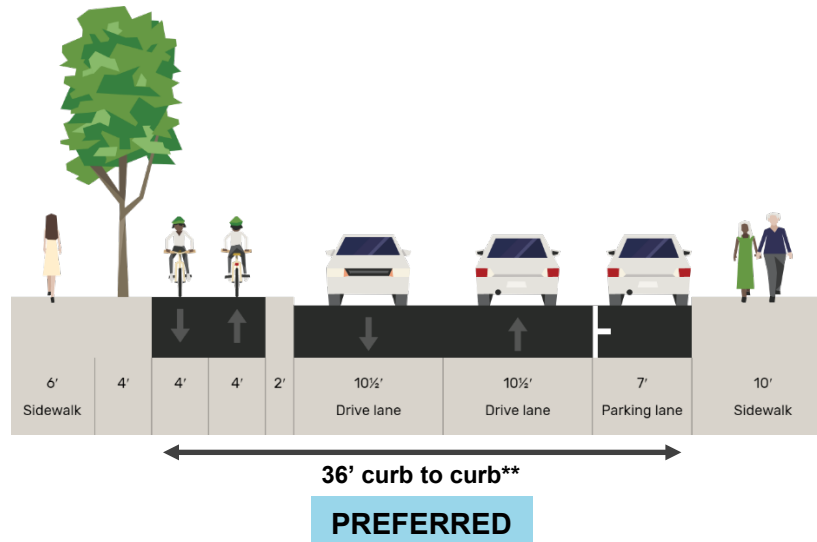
Section A (Butler Street - 57th Street to Sawyer Street) – Proposed Option 1
